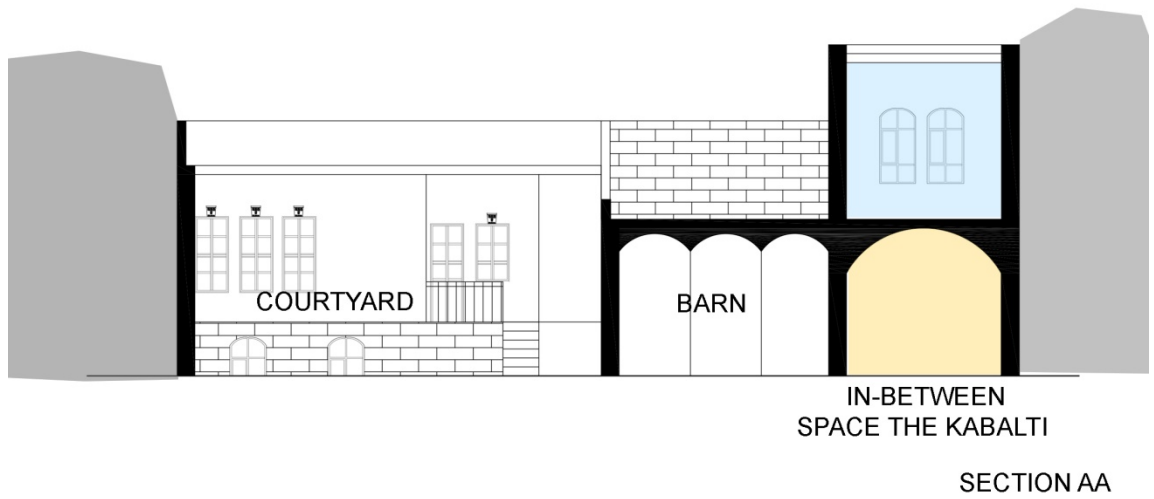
The section and elevation of Hac Recep Isgurğu Kabaltı house
